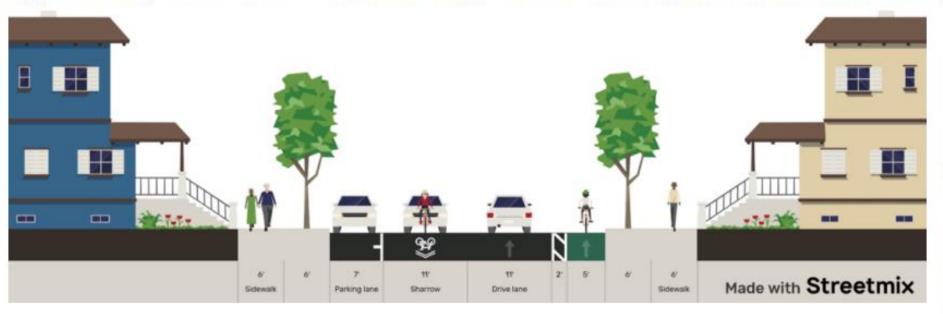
Proposed Cross Section on Centre Avenue from Bigelow Boulevard to Allequippa Street
